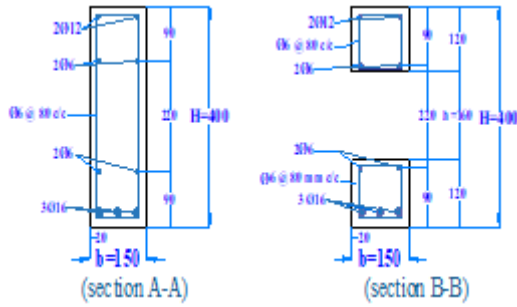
Typical reinforcement layout for tested deep beams (all dimensions are in mm)
